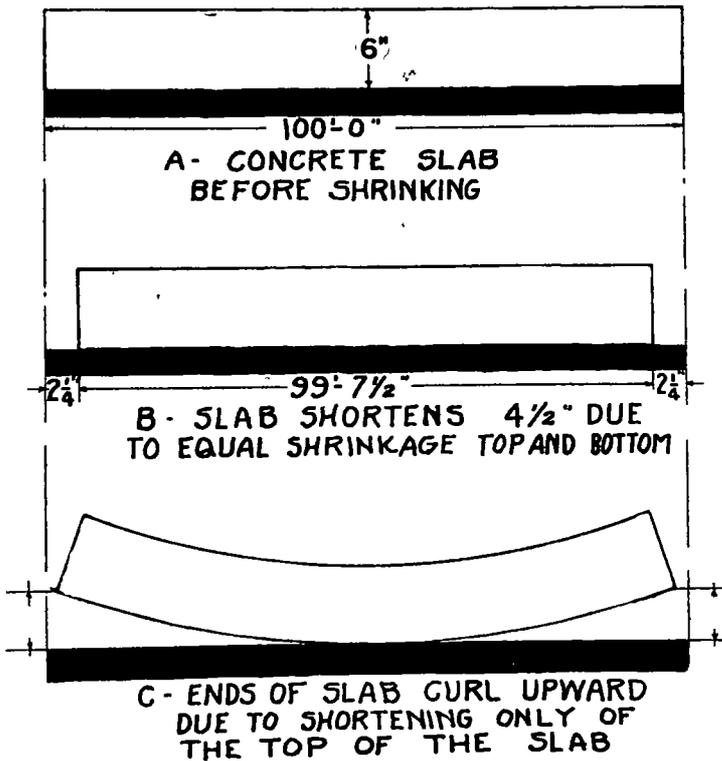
Effect of Shrinkage upon the Shortening and Warping of Road Slabs
